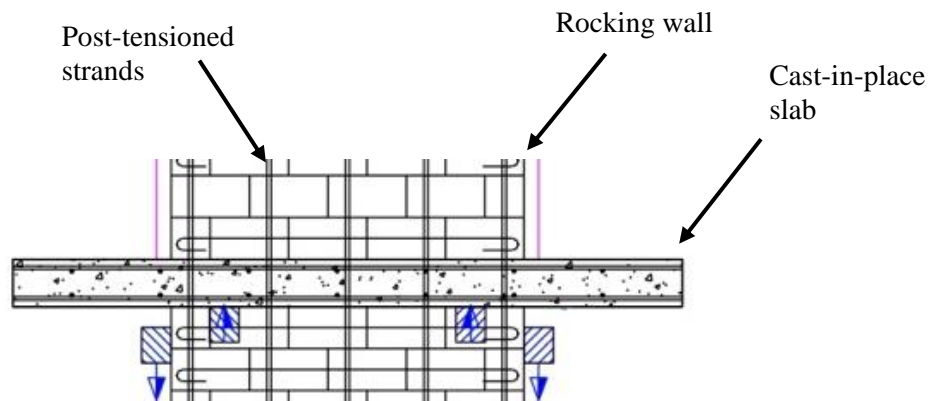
Front view of a bearing masonry wall with a cast-in-place slab (Ashour and El-Dakhakhni 2016)
